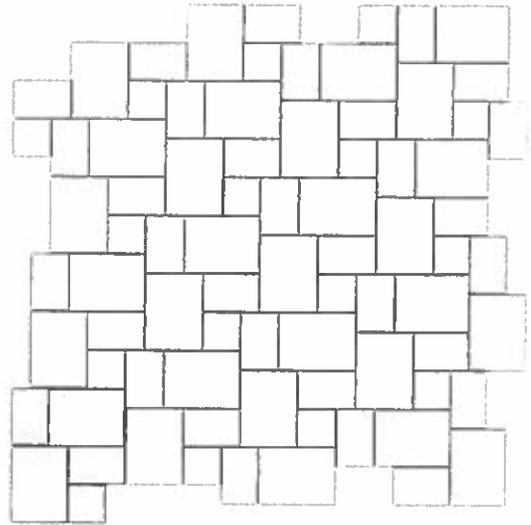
PEDESTRIAN MALL PAVING PATTERN DETAIL
